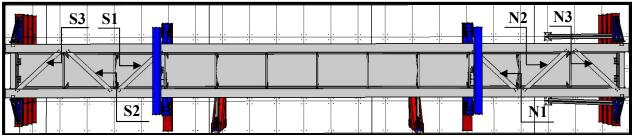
Top Lateral Truss Labels - Plan View (N and S referring North and South supports, respectively)
